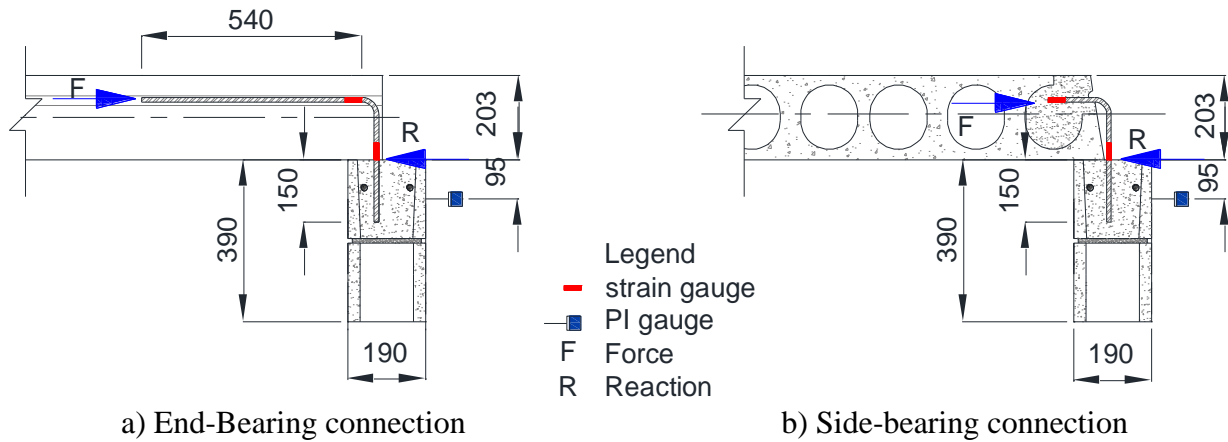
Steel bar connection detailing, locations of gauges and force eccentricity
